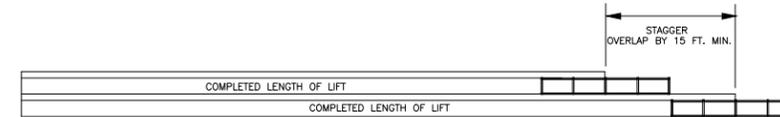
STAGGER FABRIC OVERLAPS A MINIMUM OF 15 IN. BETWEEN LIFTS.
